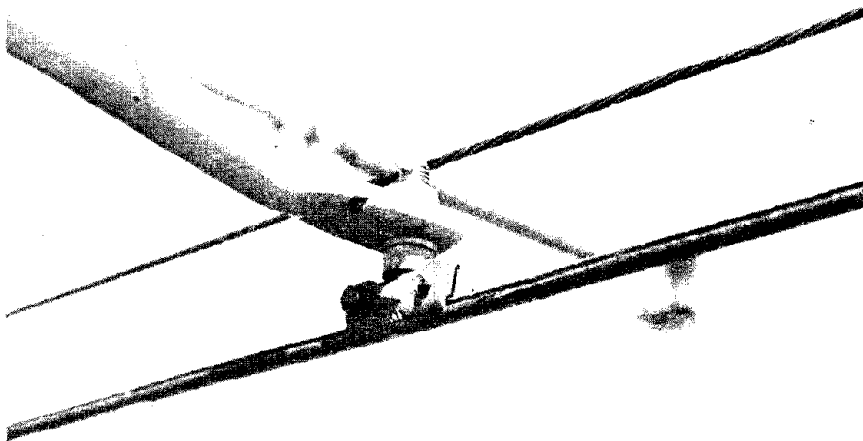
DAMAGED REGISTRATION ARM IN THE 'LIGHTLY' DAMAGED SECTIONS.
